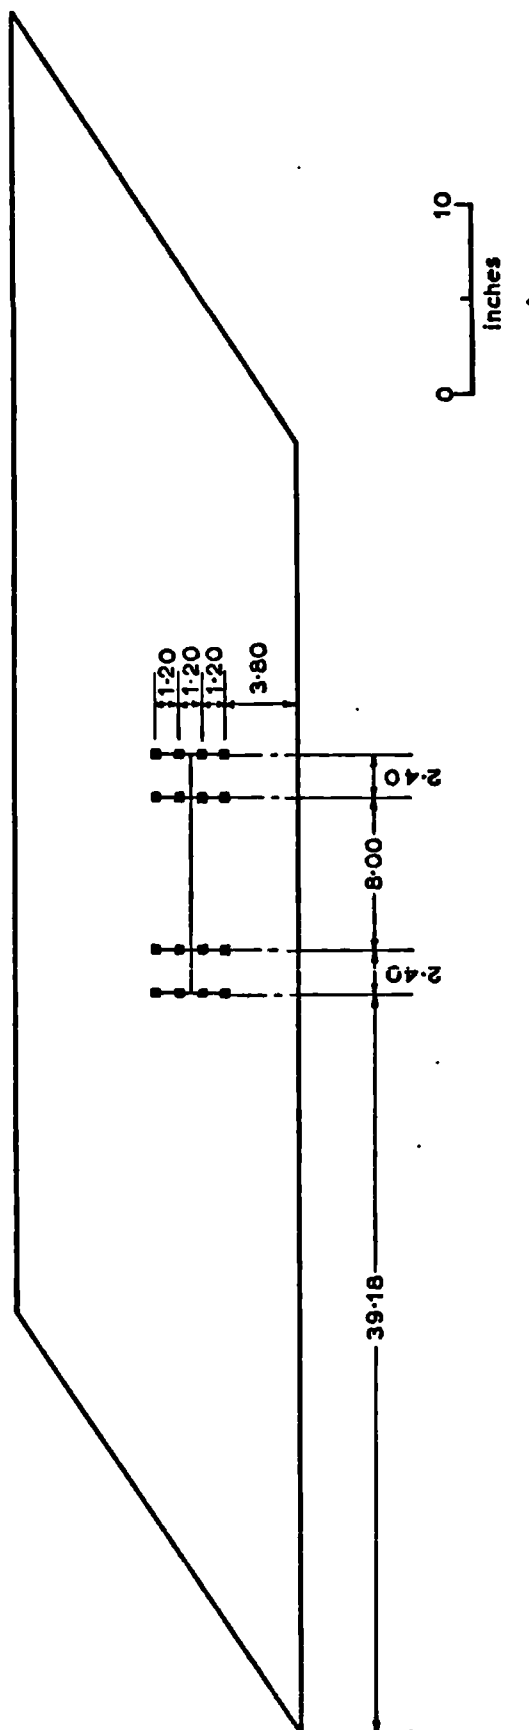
Skewed composite twin cell box girder bridge model.
